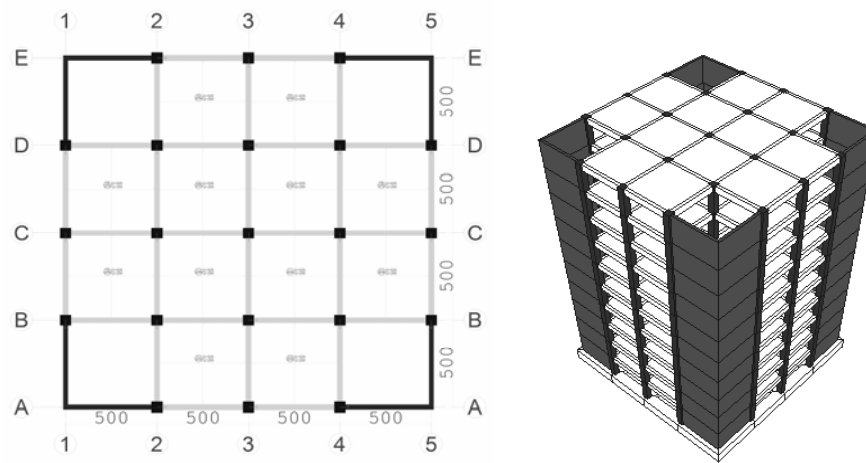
Structural plan and 3D view of parametric model IIIb
